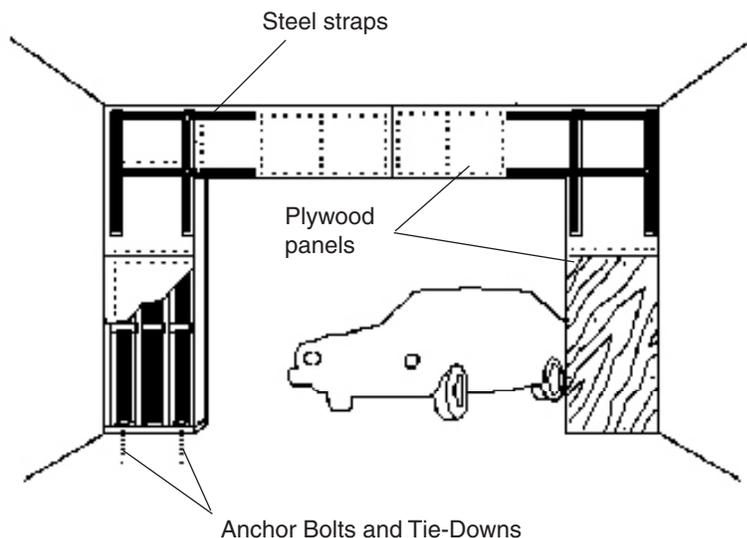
Bracing garage walls. If your house has a room over the garage, the garage walls may not be strong enough to hold up during an earthquake unless they are braced with plywood panels and steel straps.
